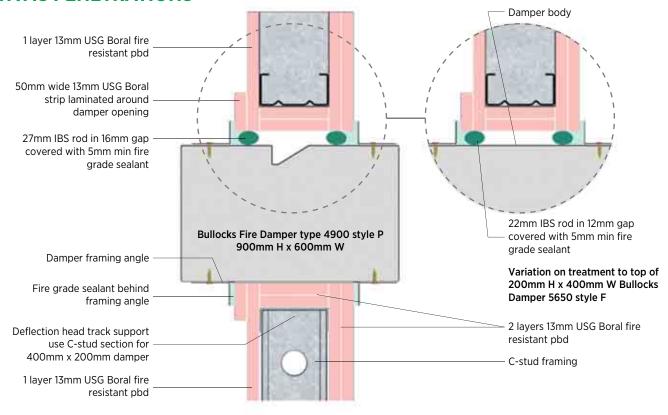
Typical Fire Damper Detail - FRL 90/90/90 Steel Stud Wall
